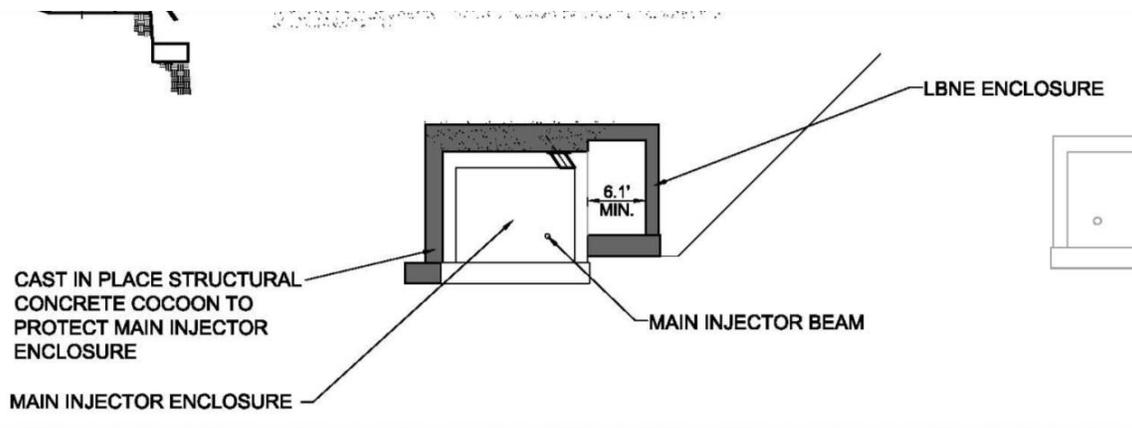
Beamline Extraction Enclosure at the connection to the MI enclosure showing the structural concrete cocoon around the MI enclosure.
